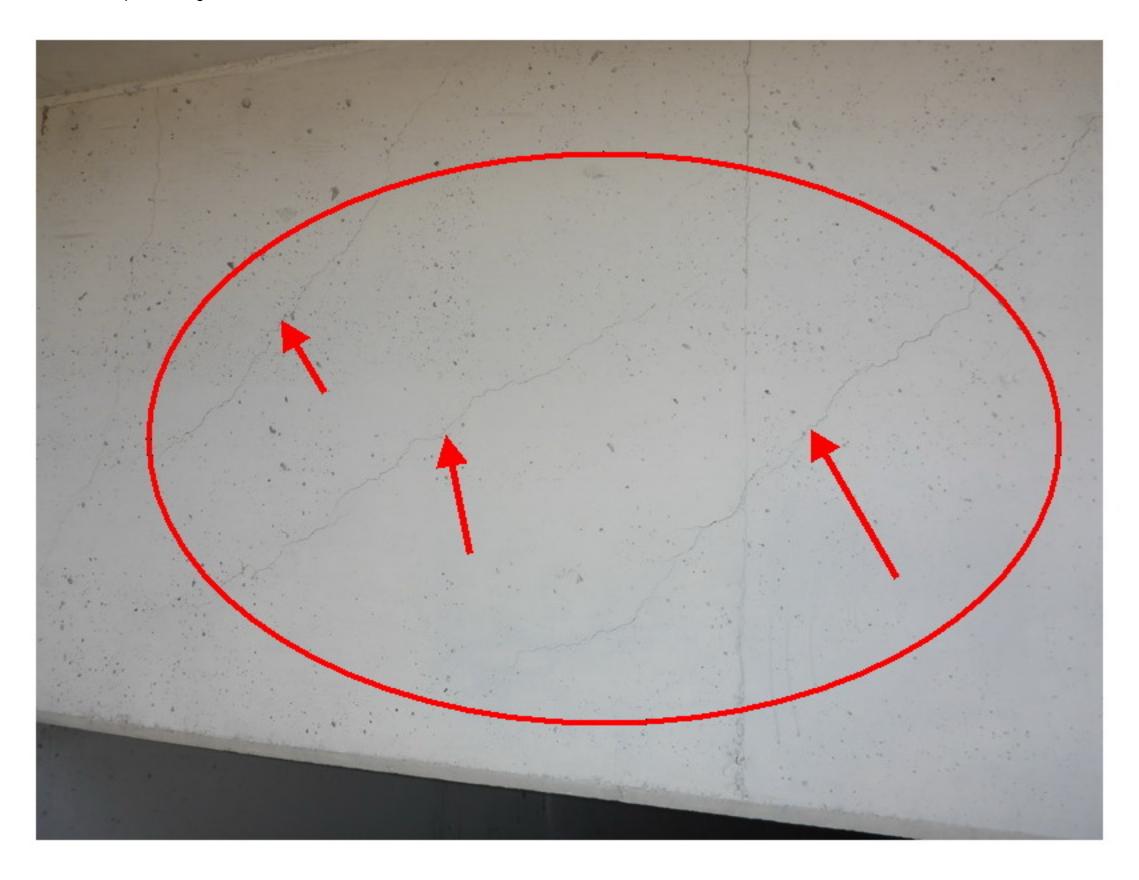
Vertical and diagonal crakes at the RC girders near the supports.
